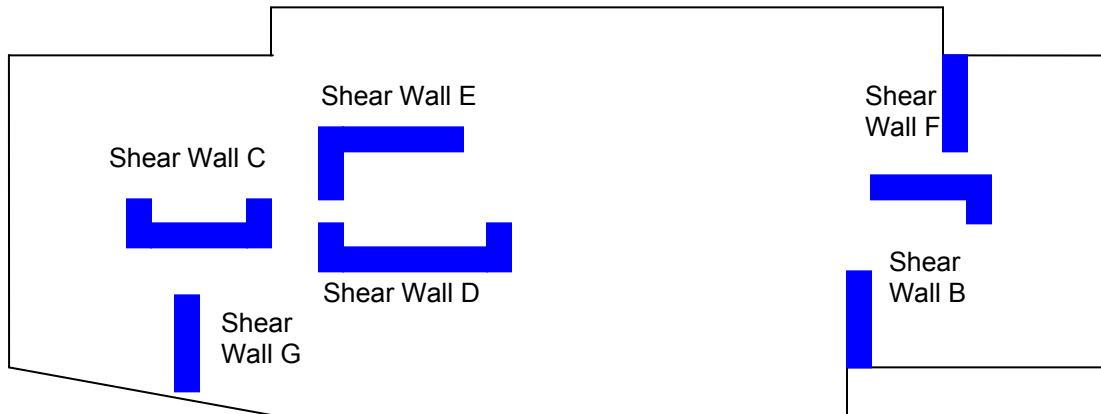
Shear Wall A is located on floors 1-7, which is not shown on this diagram
